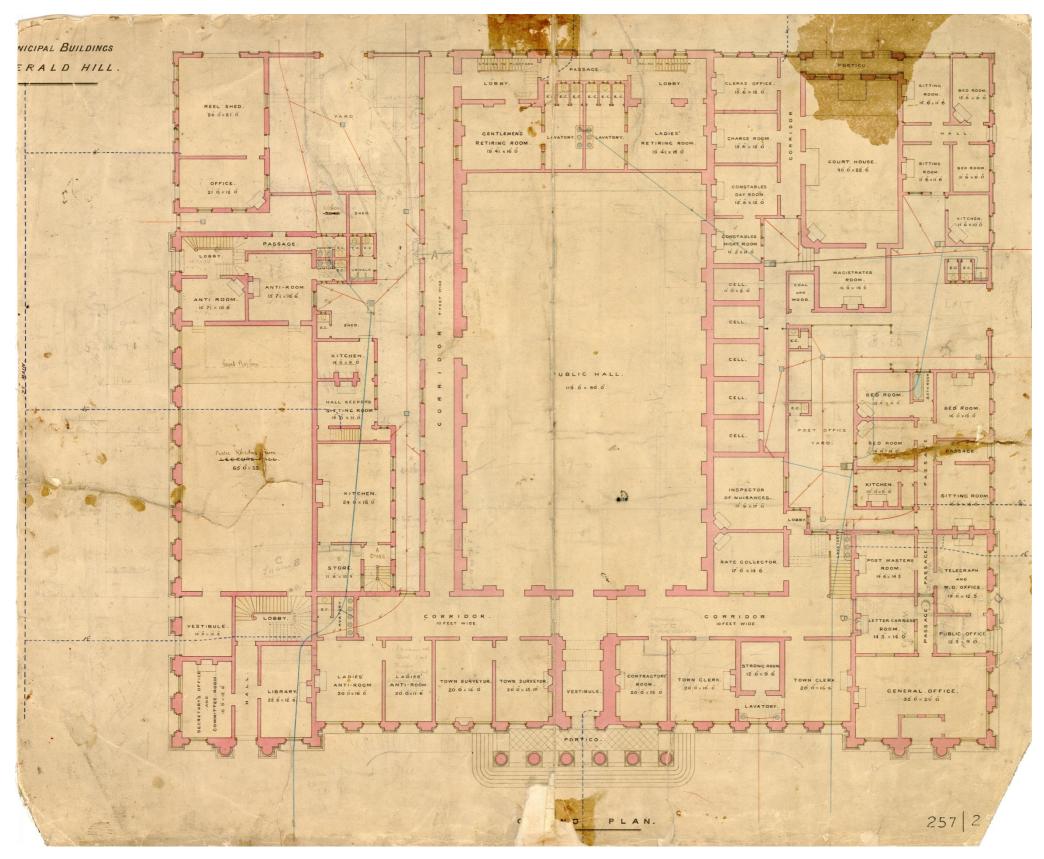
Original c. 1878 ground floor plan Source: City of Port Phillip
